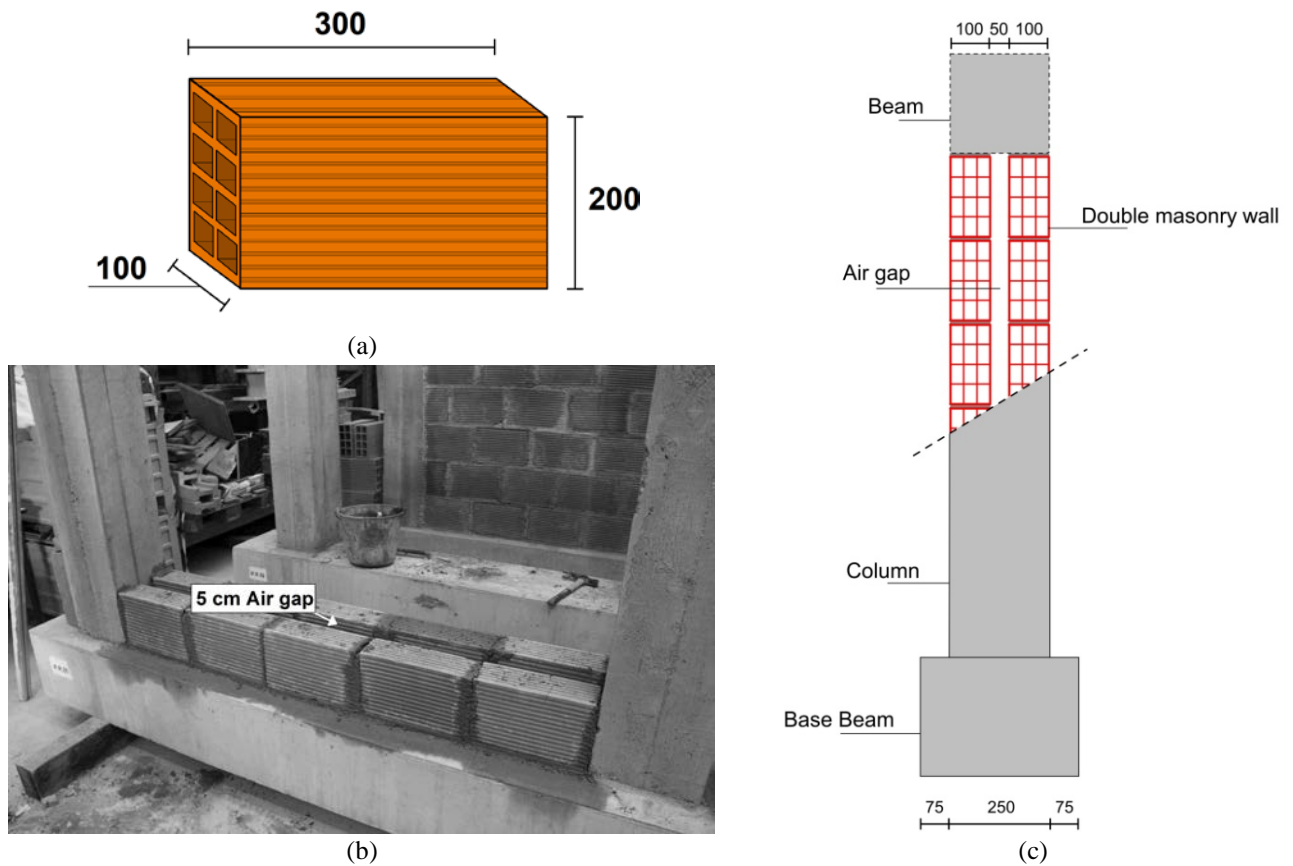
Construction method for masonry double wall (dimensions in mm) : dimensions of the brick element (a), (b) and (c) double masonry wall details
